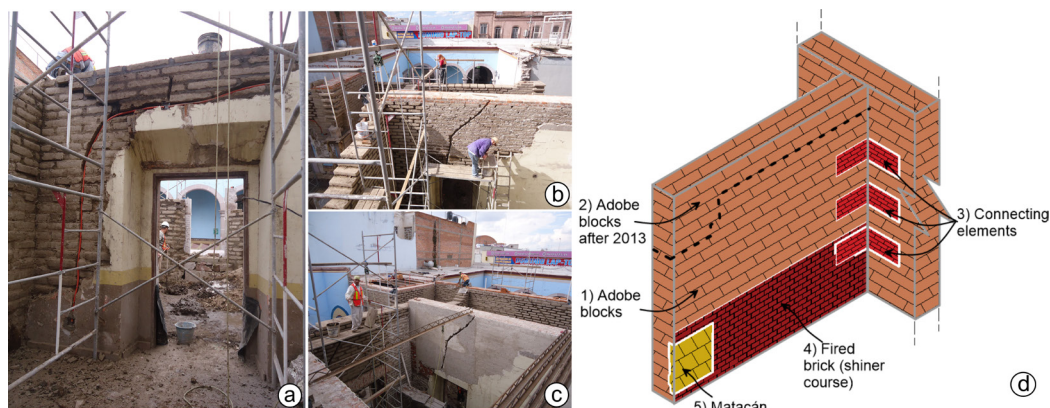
Reconstruction of dividing wall. a) Placement the first rows of adobe over the door. b) Insertion of mortar and small elongated stones joints. c) Reconstructed wall covered with slaked lime mortar (32). d) Drawing showing the different materials that make up the study wall.
